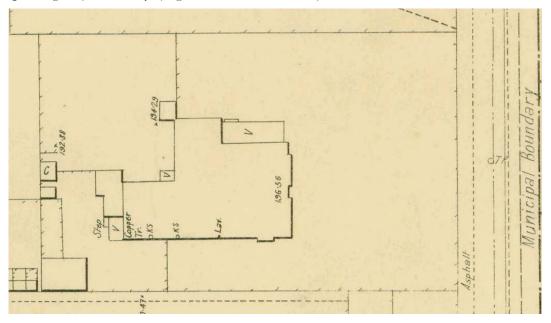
MMBW Detail Plan No. 976, dated 1901, Prahran. Showing 'Nauroy' and its original (and current) extent (source: SLV)
